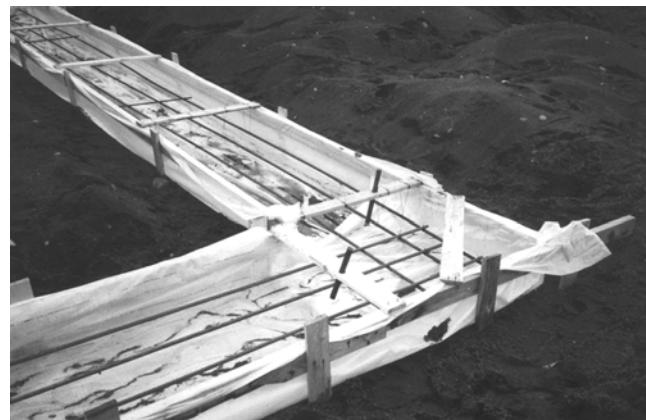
Footing reinforcement placed in fabric forming system.
